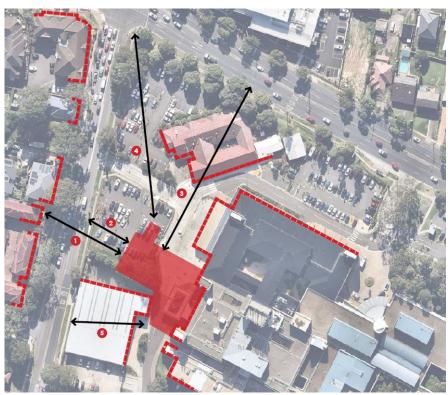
Building setbacks in relation to surrounding context Source: HDR Architects
